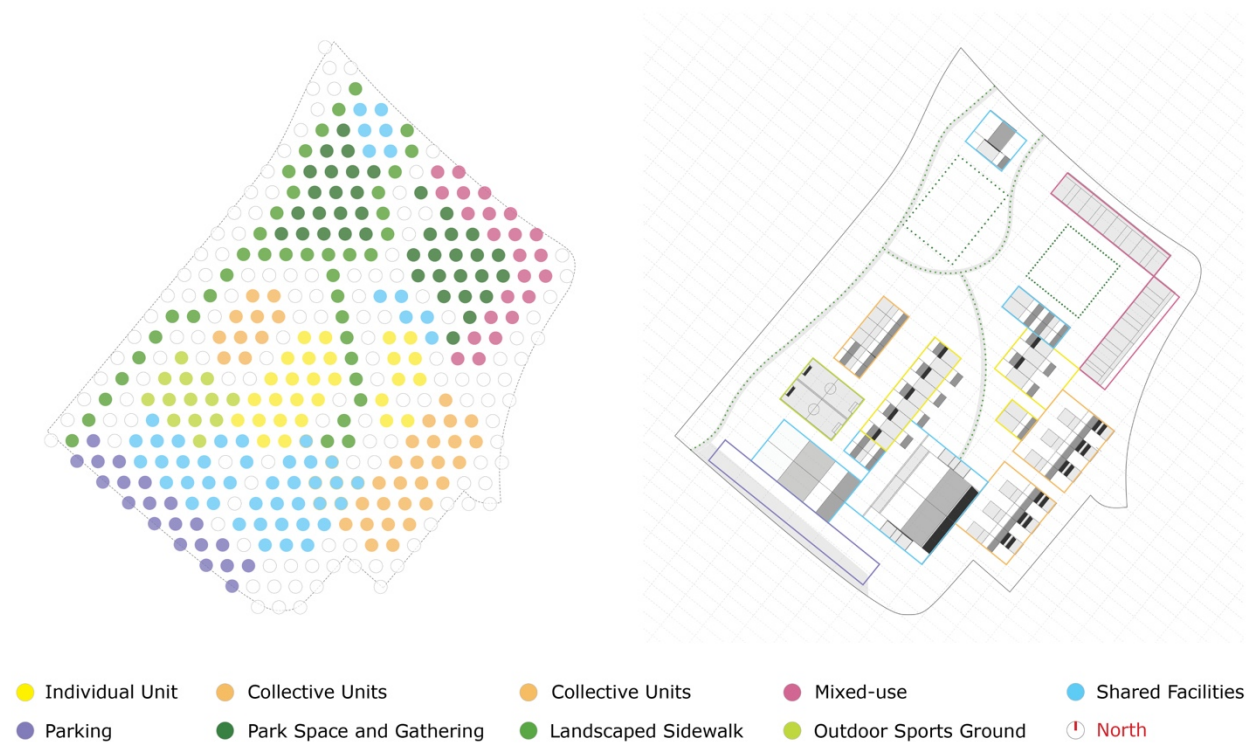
Kaka’ako Transition Village. Activity Plan (Left) and Site Plan (Right).
